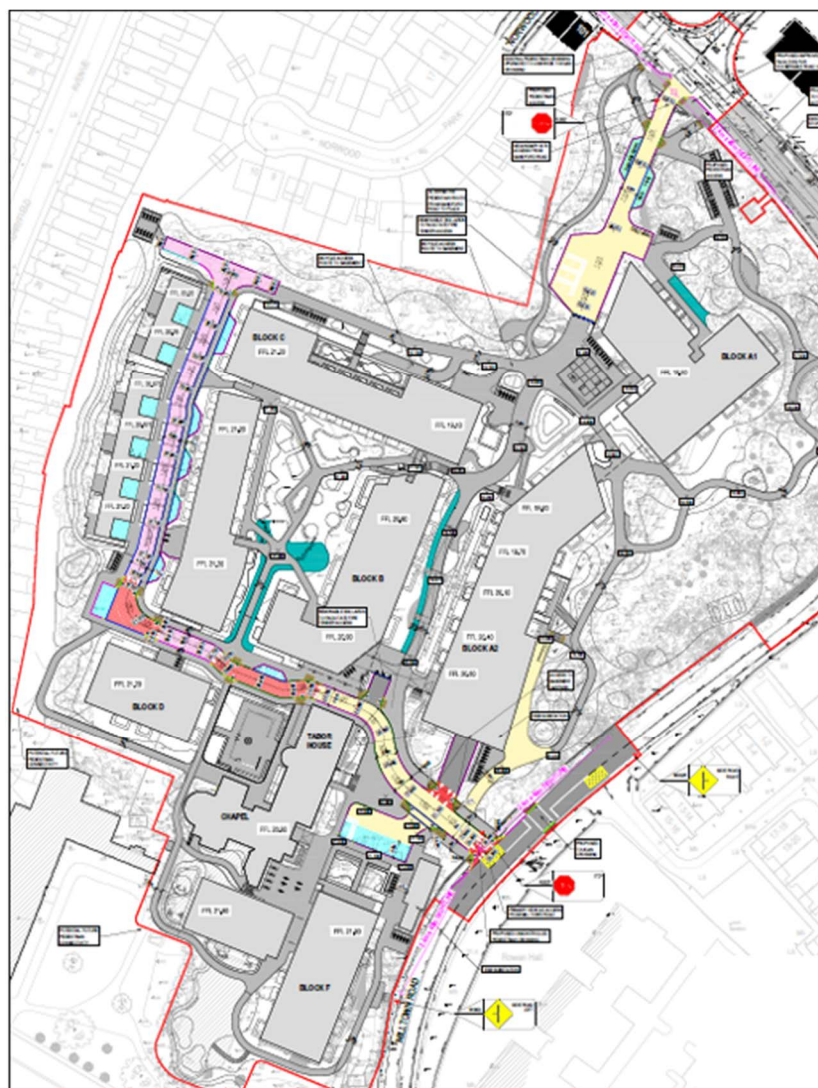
Subject Site Road Layout (Source: DBFL Drawing No: 190226-X-04-Z00-DTM-DR-DBFL-CE-1201)
